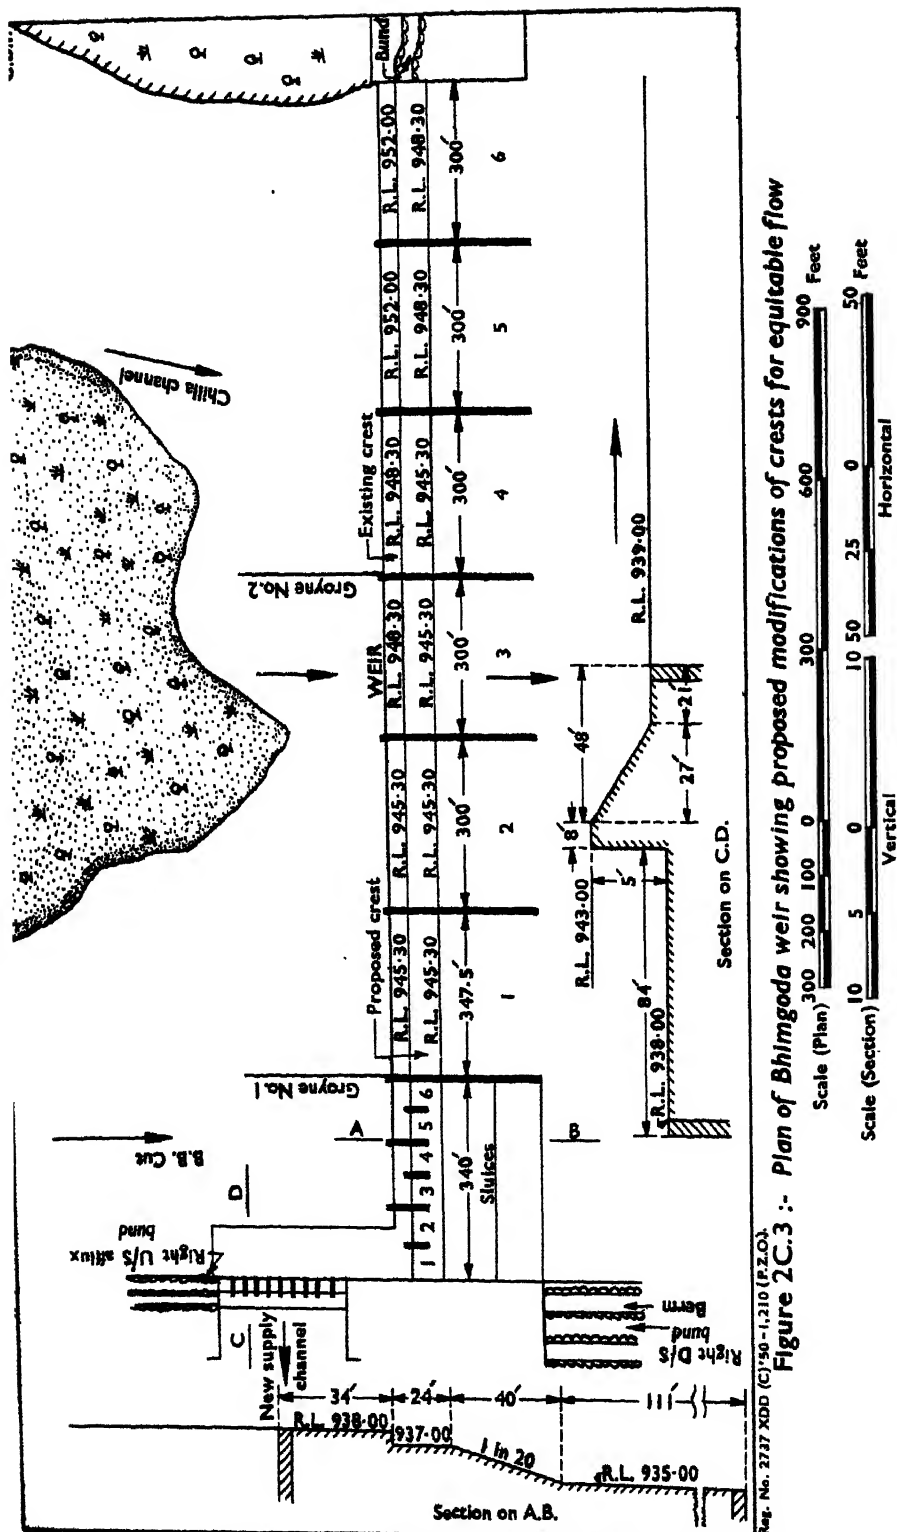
C.3 :- Plan of Bhimgoda weir showing proposed modifications of crests for equitable flow
